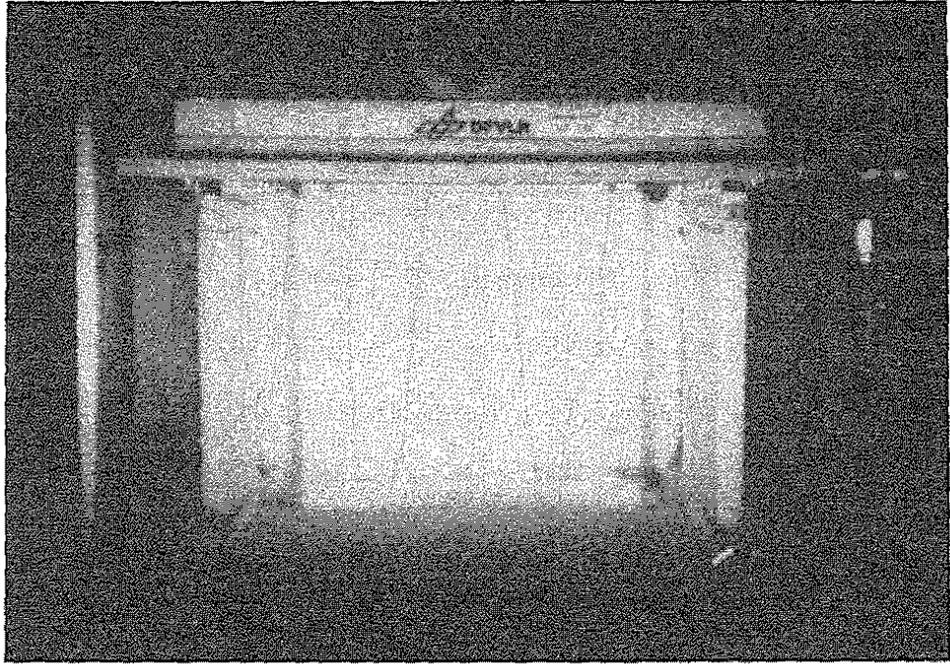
Slightly Deformed All-Sandwich Specimen
